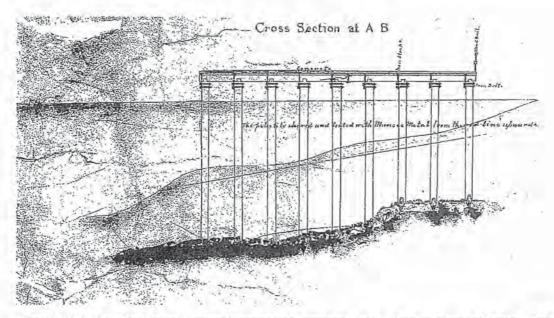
1853 Detail of plan for the extension of the semicircular quay showing the plan for piles for the wharf decking. The timber piles were to be positioned at regular intervals in a grid pattern, then topped with cross beams and timber decking. Each was tipped with a metal cap for driving through the stream bed and into the harbour floor. (Source: State Records of NSW AO Plan 5641)
